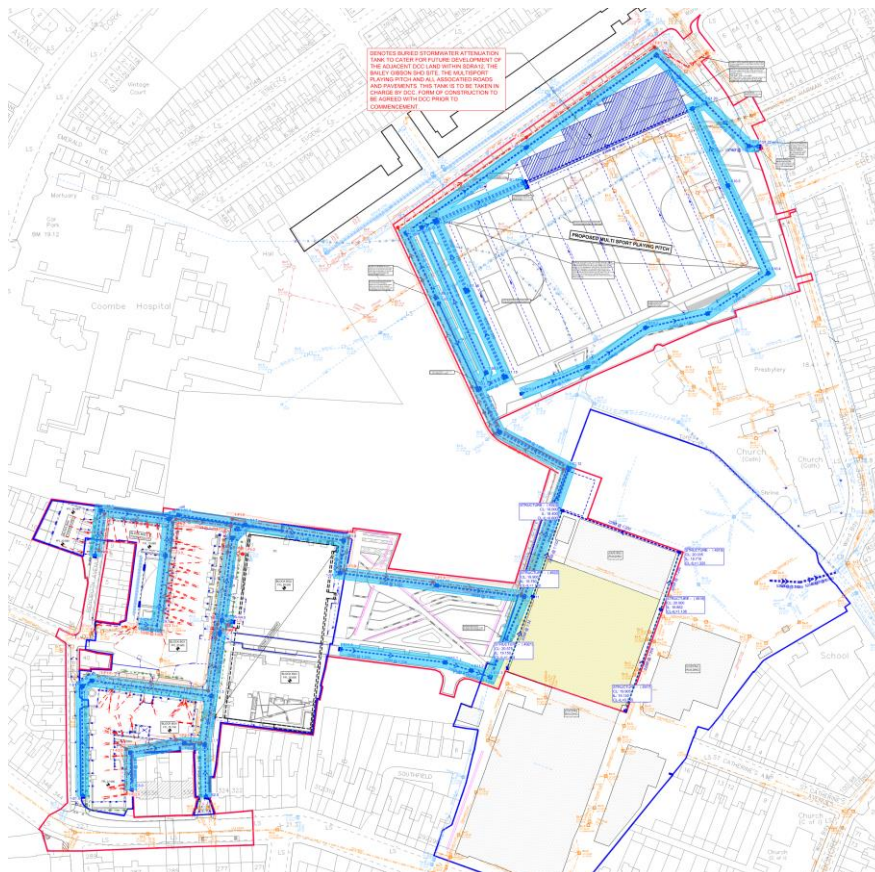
Proposed Surface Water Drainage (Extract from Engineering Drawing Set)
